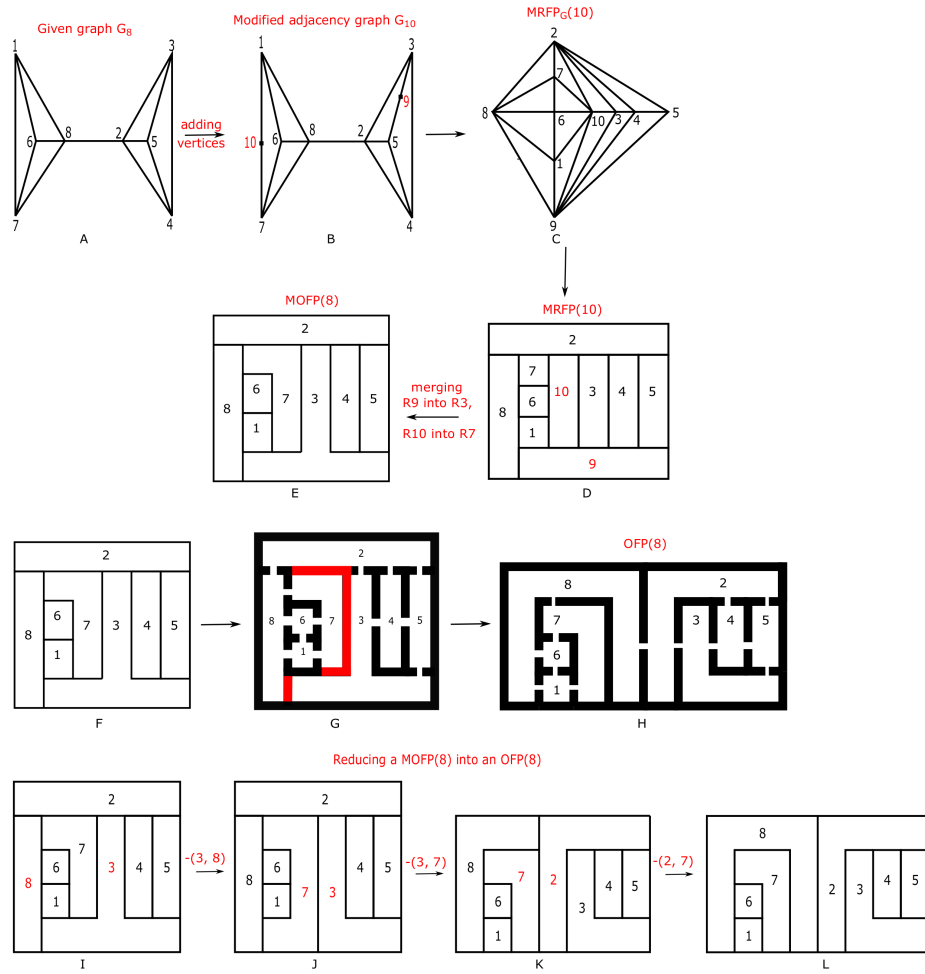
Constructing a maximal orthogonal floor plan for a given adjacency graph for which maximal rectangular floor plan does exist and then reducing it into a floor plan corresponding to the given graph by eliminating the extra connections
